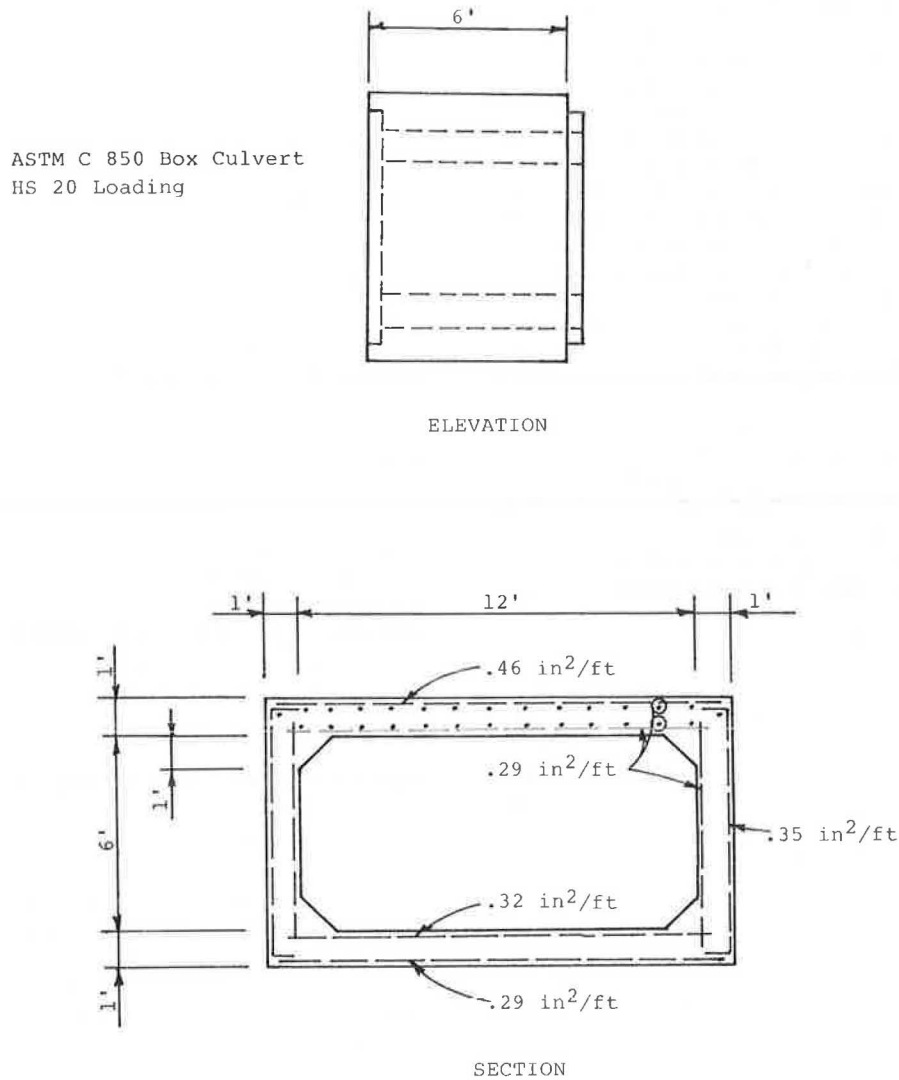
Details of 12-ft by 6-ft box culvert (Ohio DOT bridge MAR-309-09.42).
